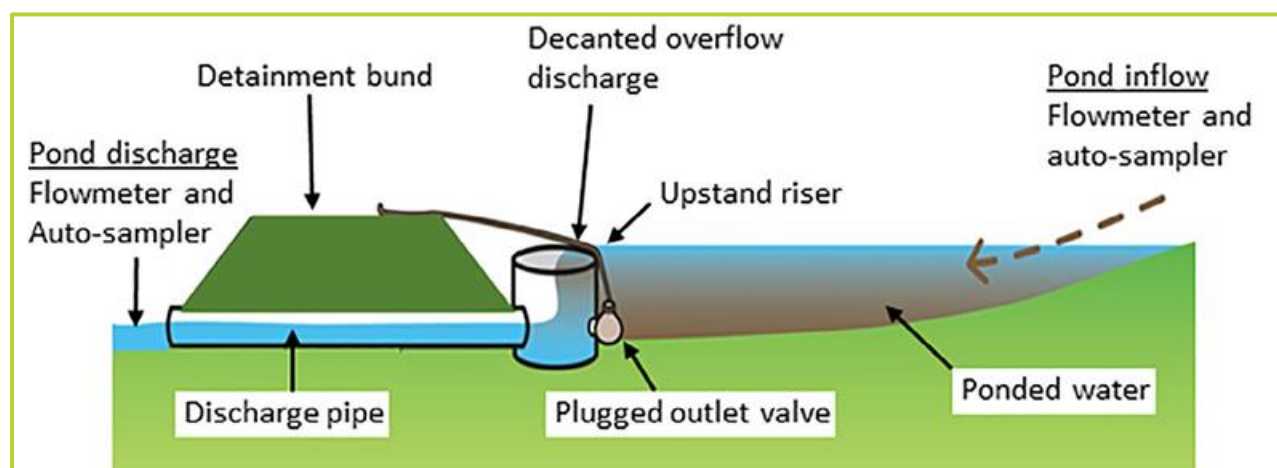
Cross-section of the detainment bund structure on pastoral land (Levine et al., 2021).
